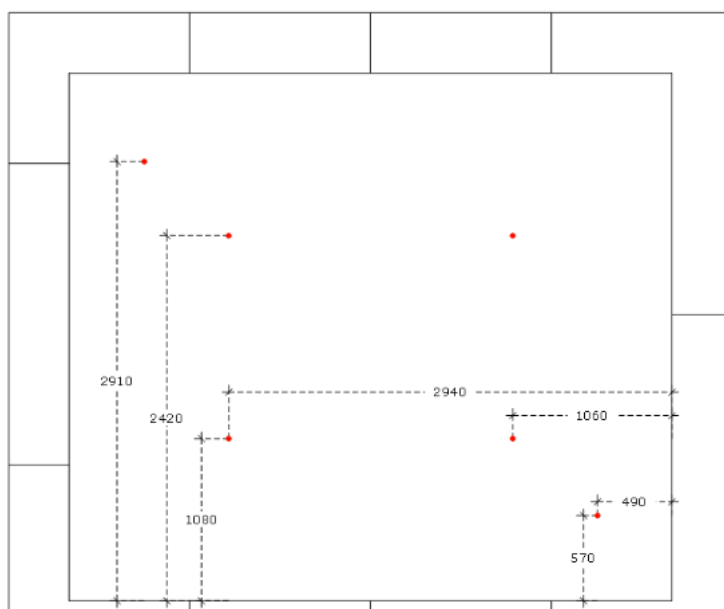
Locations of TCs on the large-scale specimen (LHD-4): inside the roof
